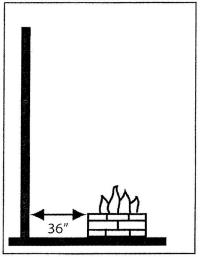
Clearance to Combustibles (Not to be used in an enclosed space)
